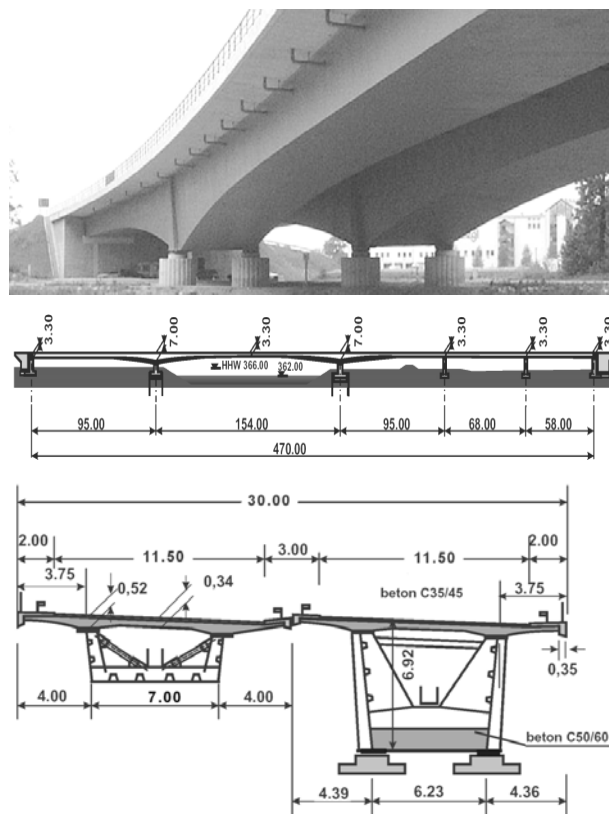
Bridge over the Inn River in Neuötting – general view, longitudinal section and cross-sections of main span [8]
